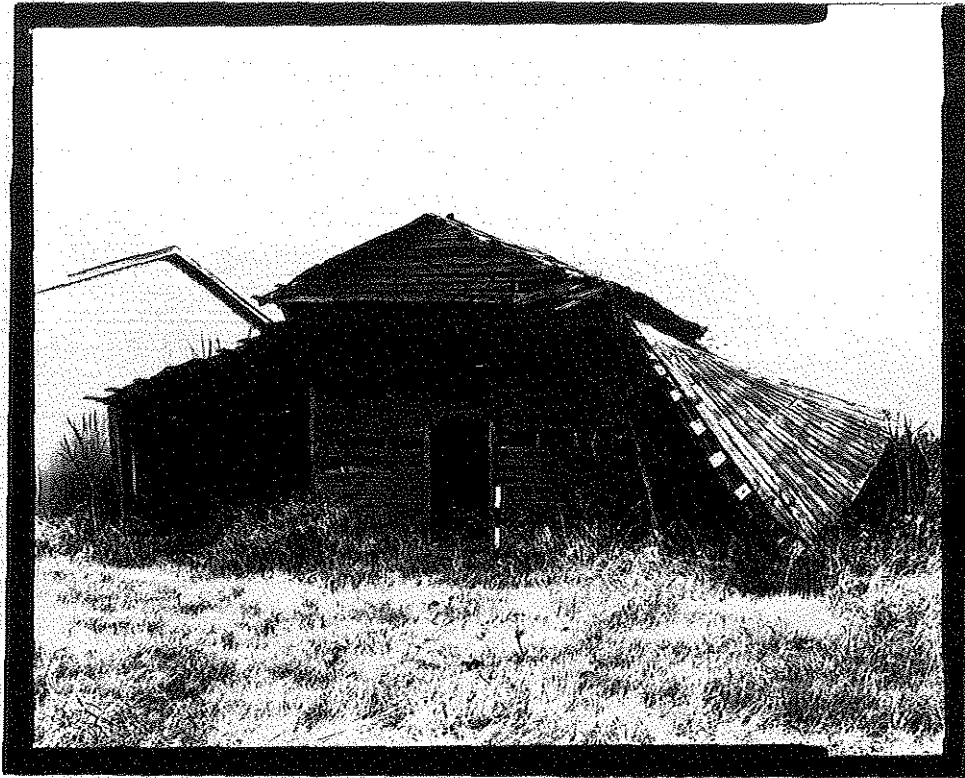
Front (Southern) Facade of Hay Barn, Morrison House.
